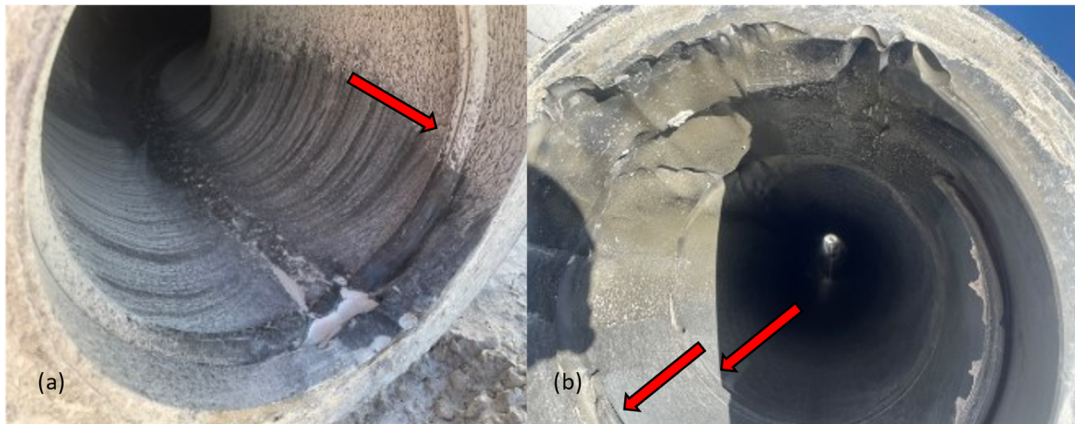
Wear effects of weld beads in high-density polyethylene (HDPE) pipes: (a) HDPE slurry pipe cut at profile next to a weld bead; (b) HDPE pipe with two visible weld beads and significant wear around the bead
